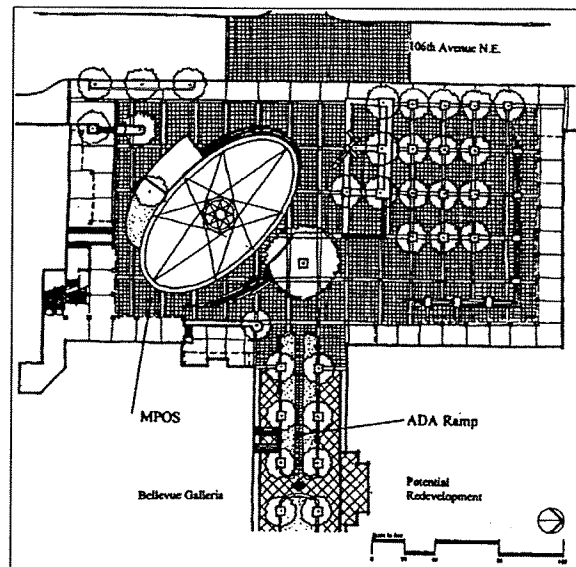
106th Avenue NE MPOS Illustrative Plan
